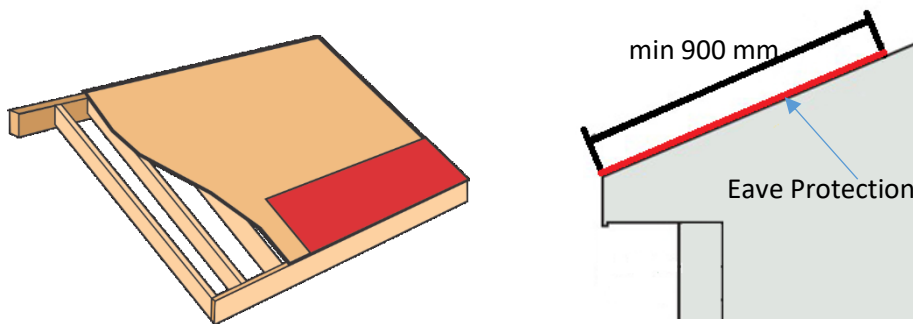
8 Eave installation on a steep slope asphalt roof on top of the deck
